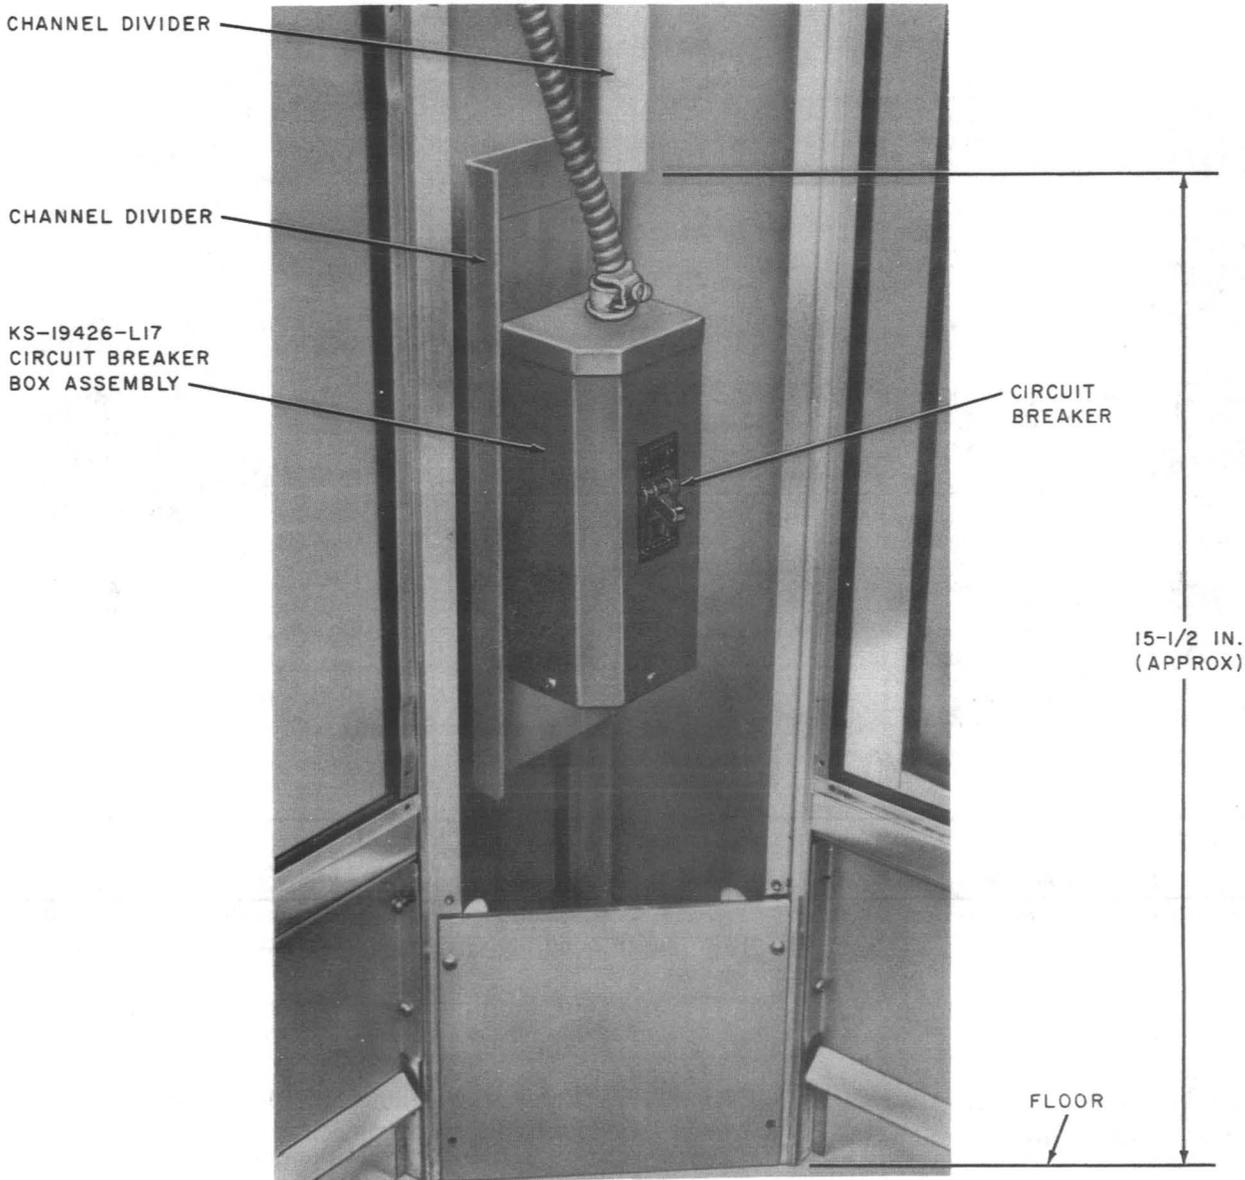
KS-19426, List 17 Circuit Breaker Box Assembly, Installed
